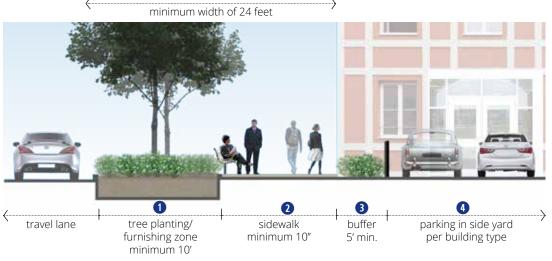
Primary Street Frontage - Side Yard Parking Perpendicular to Street (Refer to 27-XXX for description of permitted layout)
